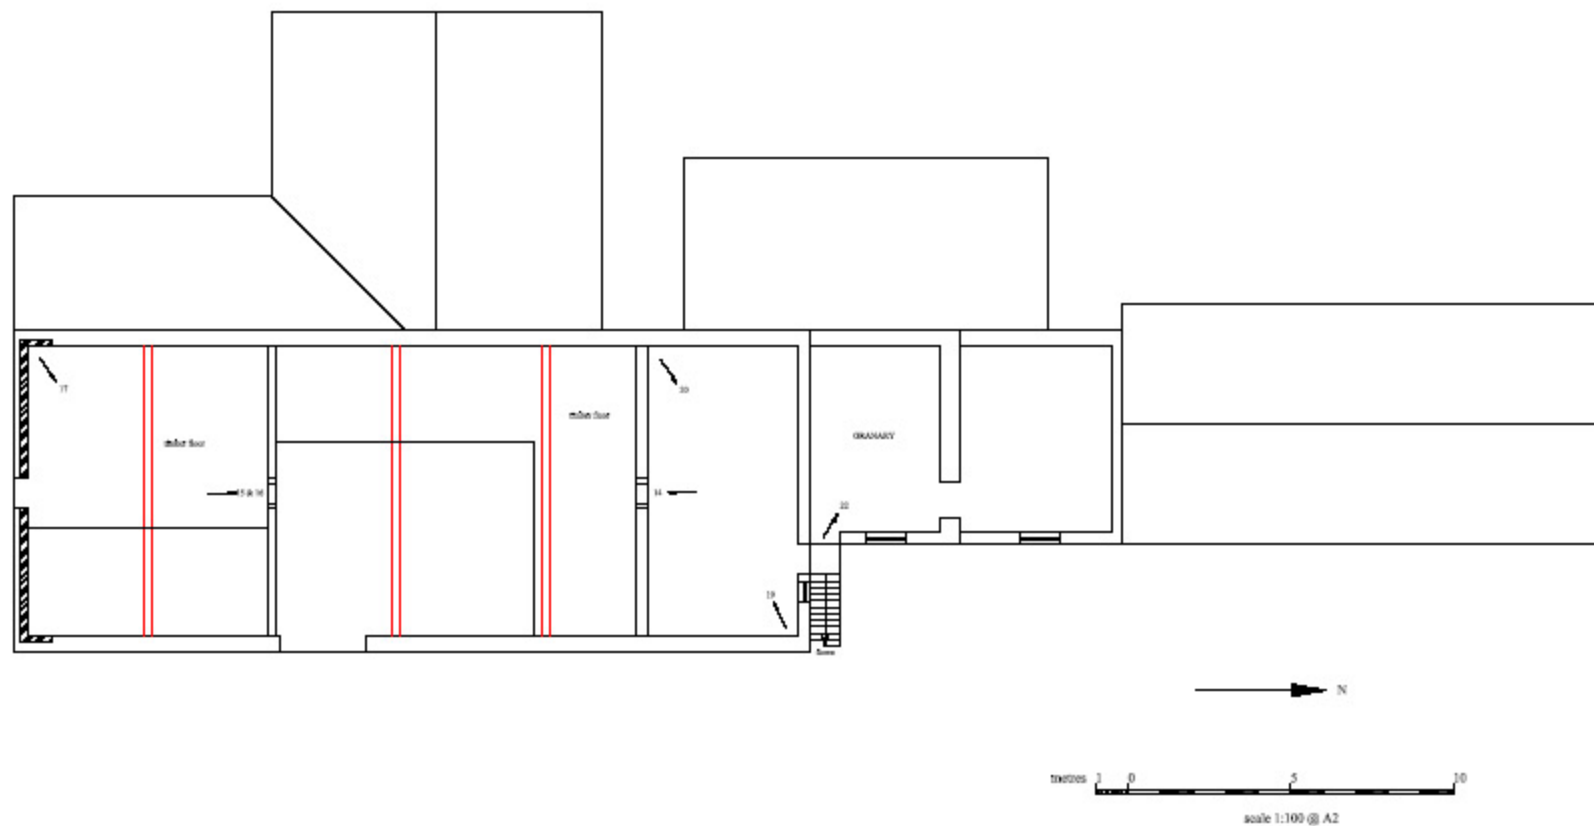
First Floor Photo Plan (Nos. refer to plate nos. in report)
